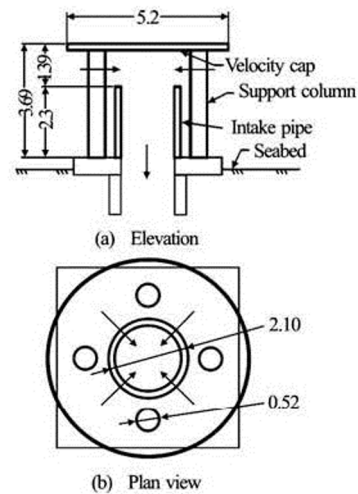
Design of the typical submerged intake structure considered in this study (m)
